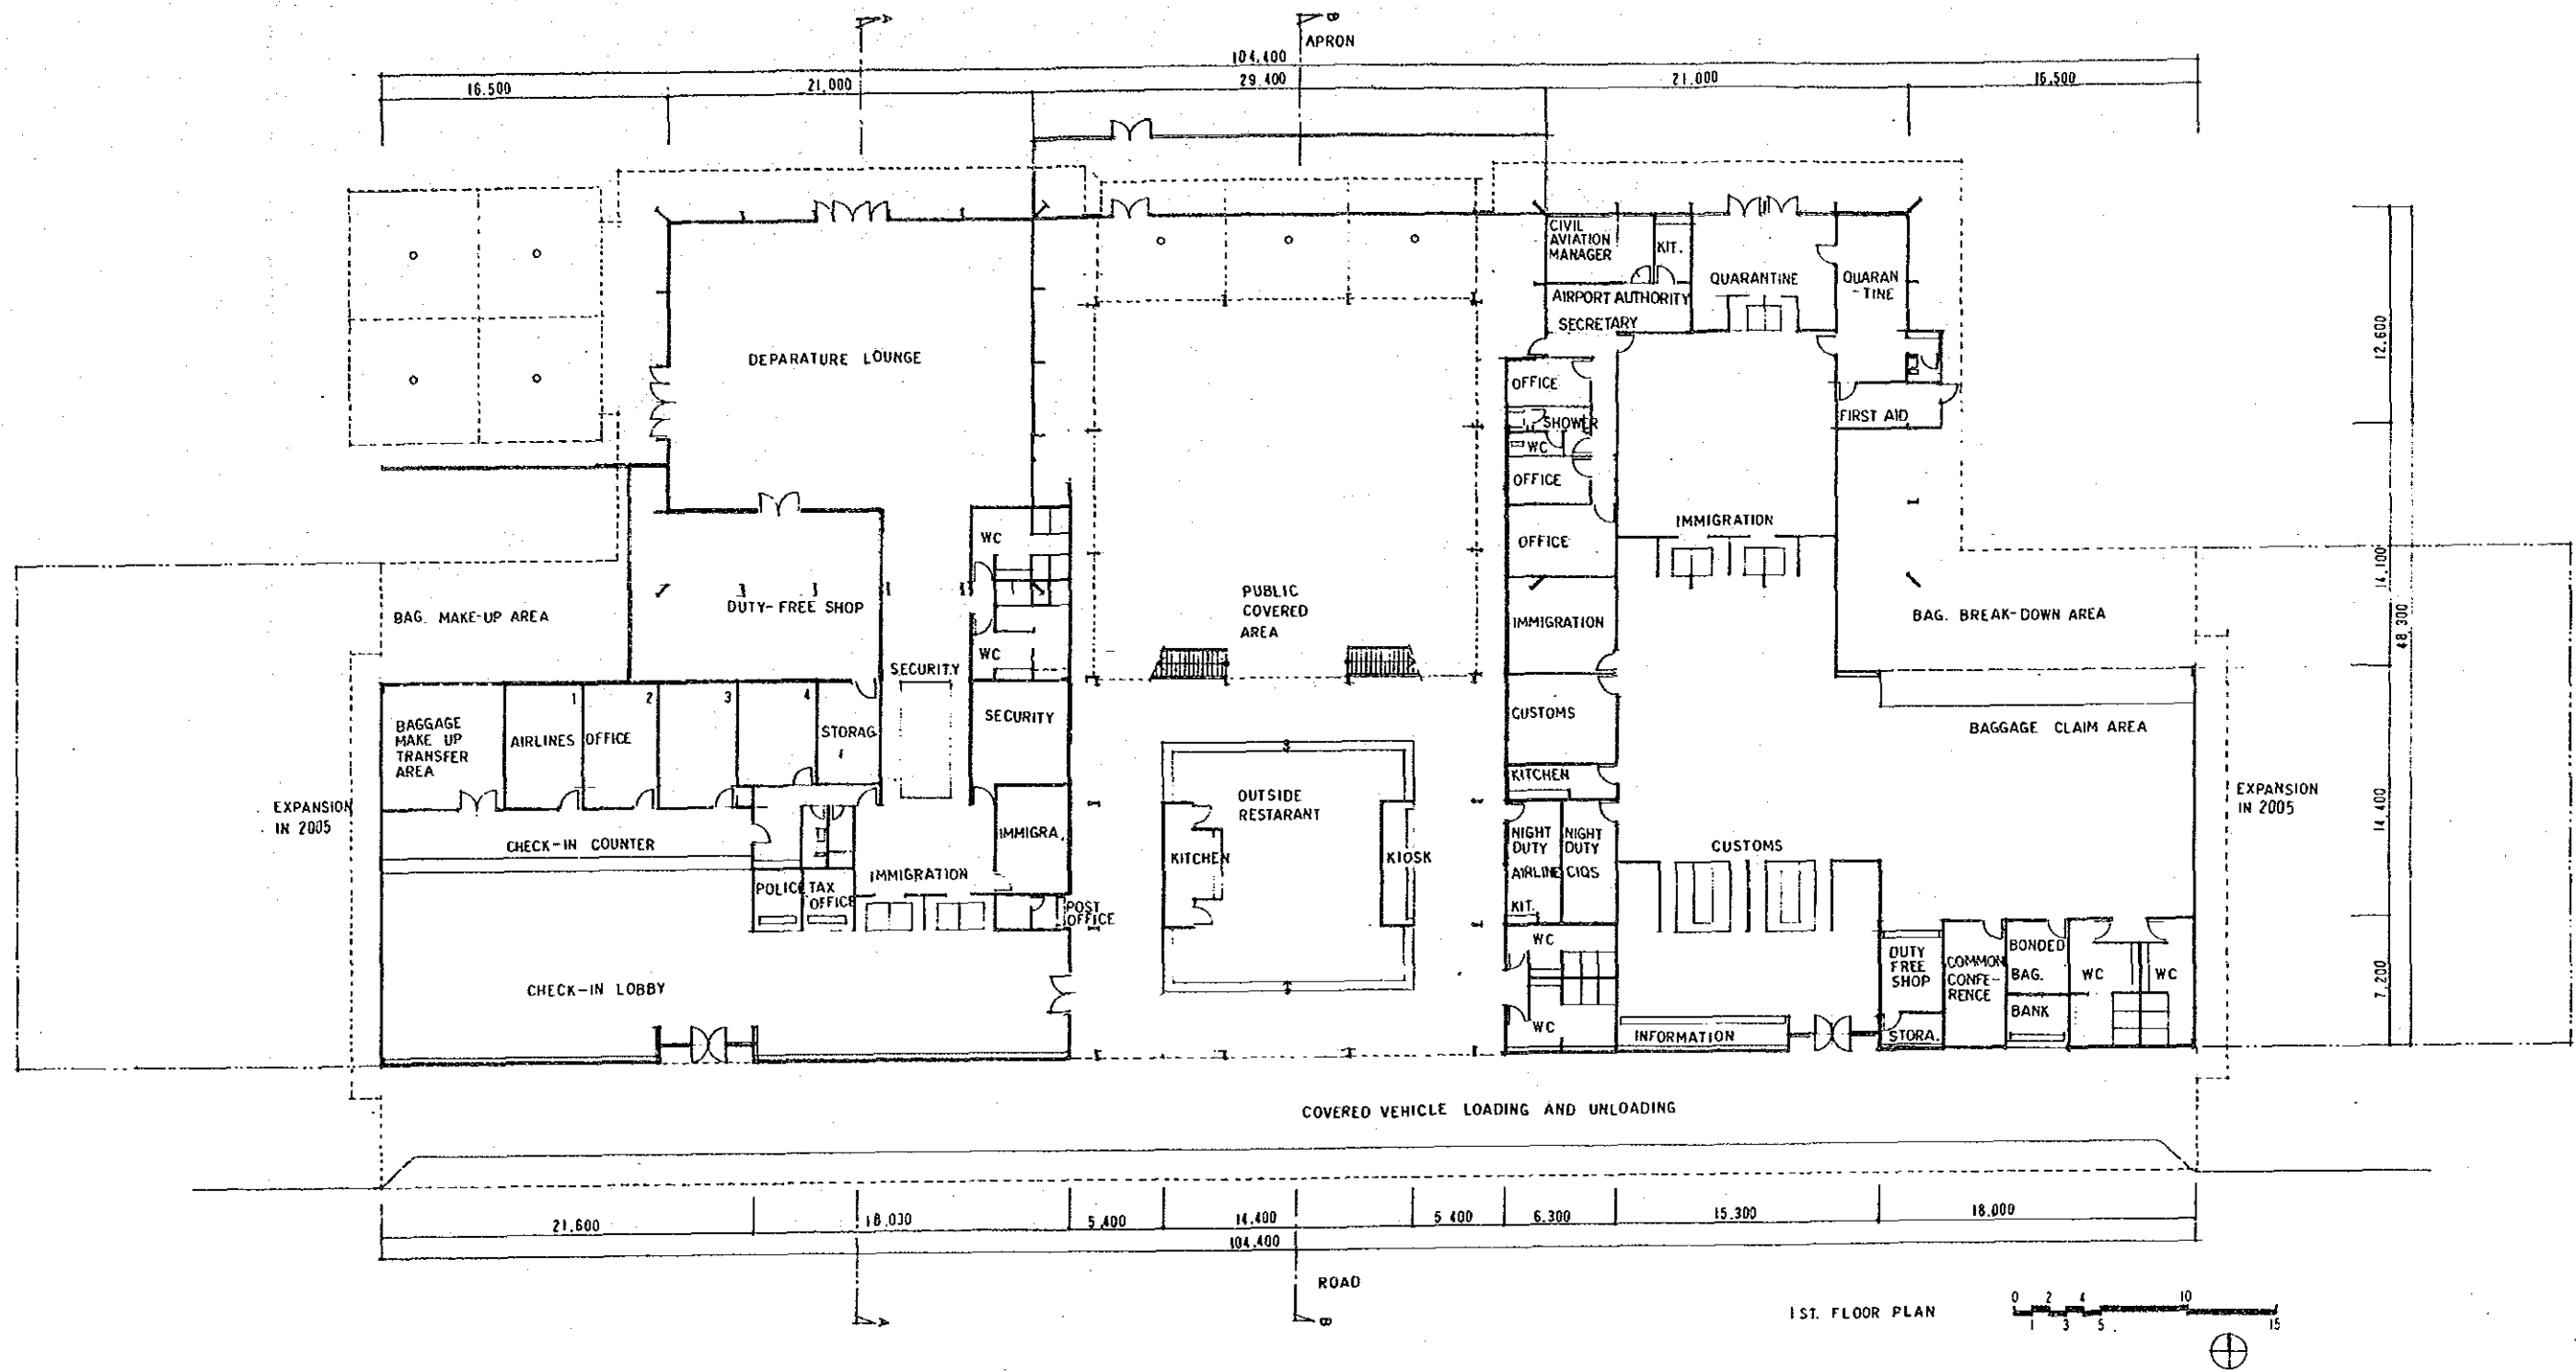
Passenger Terminal Building (First Floor Plan)
